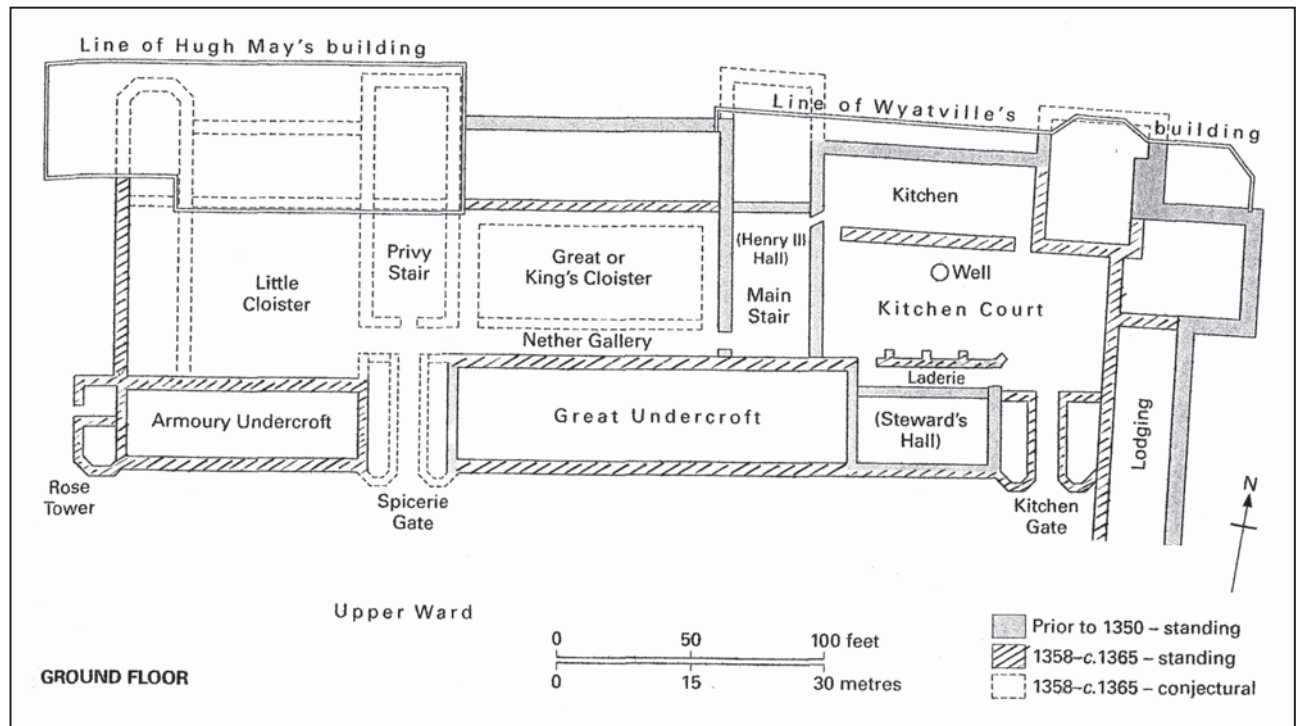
Windsor Castle: ground plan of royal apartments c.1365
